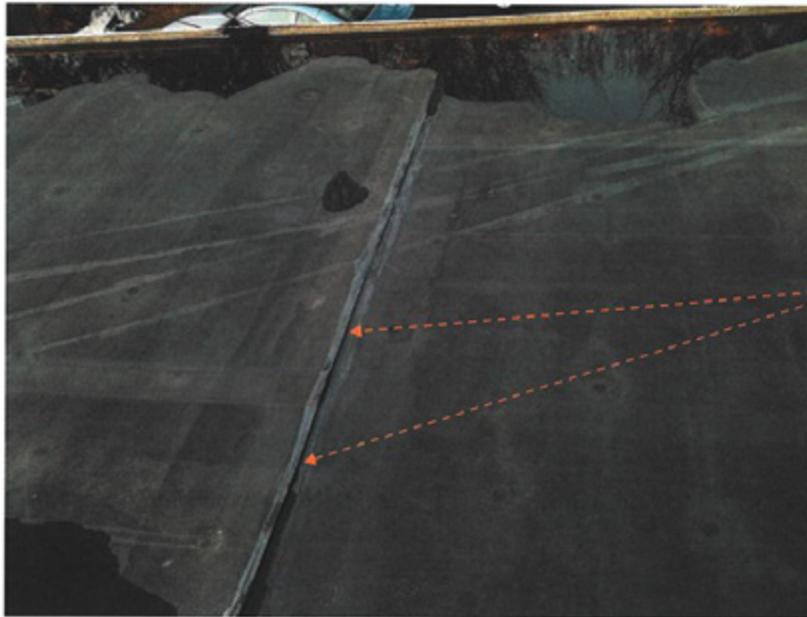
More evidence of poor-drainage - water cascades over the edge and down outside wall.
